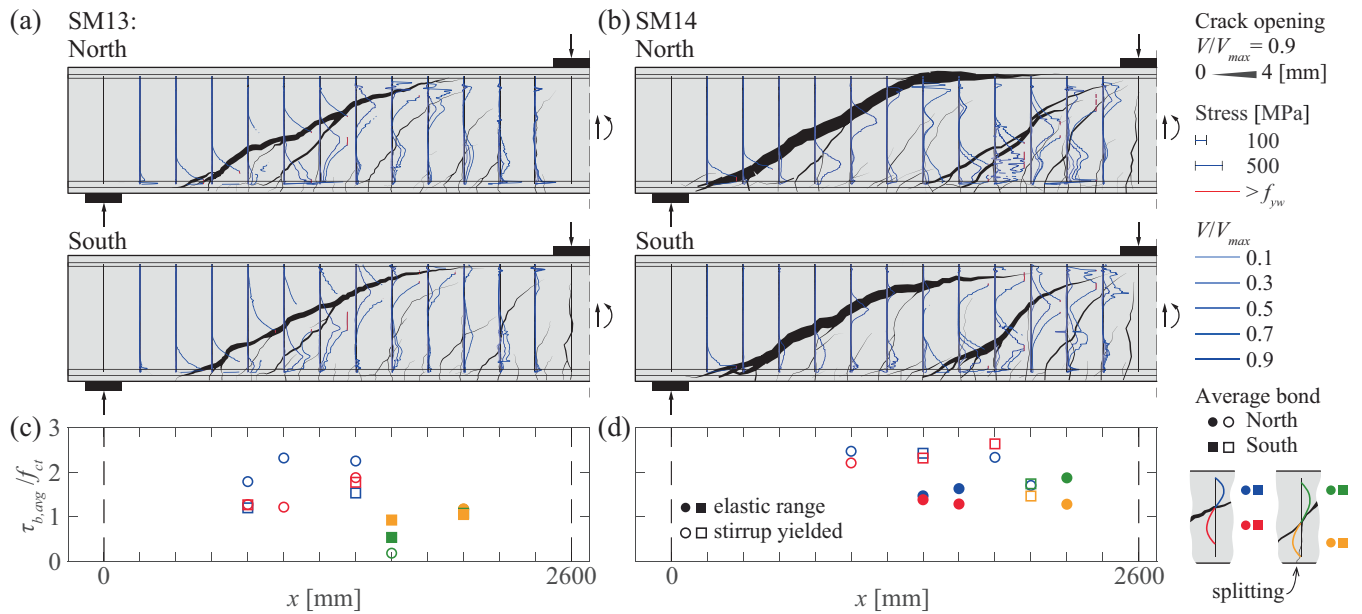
Detailed crack results of the stirrups: (a and b) crack pattern at $V/V_{max} = 0.9$ and stirrup stress distributions for five load steps; and (c and d) average bond stress (at V_{max} or before yielding of the stirrup) for specimens (a and c) SM13 and (b and d) SM14.
